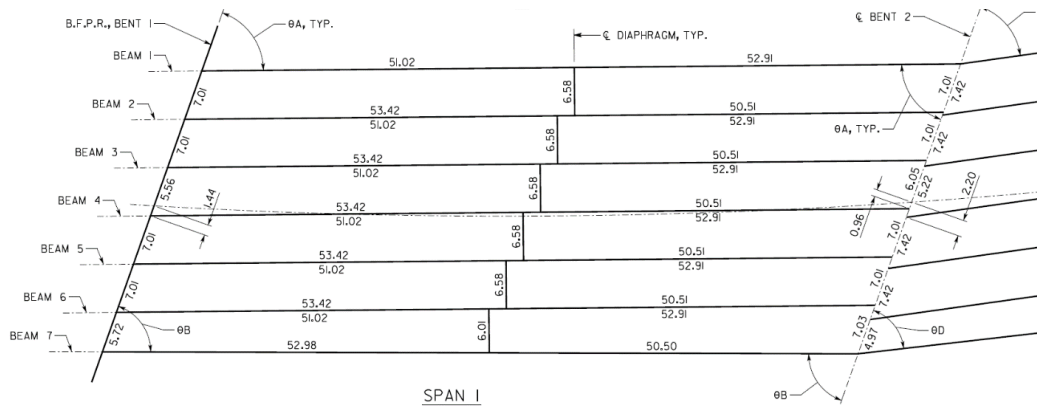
Plan view showing Span 1 PSC girders (GDOT-DRW, 2016).
